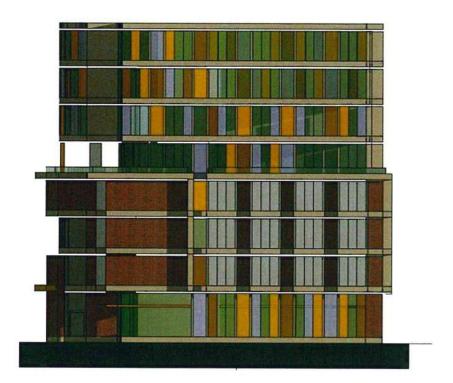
Building Elevation - The Architectural Grid North Elevation Source - B. Kimball
